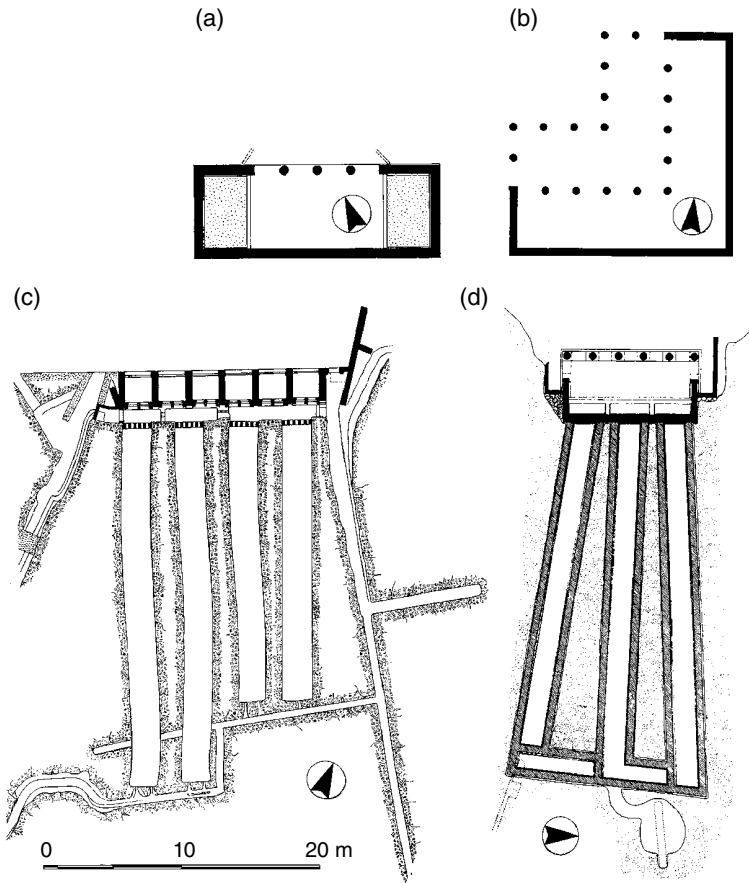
Plans of Fountains at uniform scale: (a) Southeast Fountain House (Athens); (b) Southwest Fountain House (Athens); (c) Peirene Fountain (Corinth); (d) fountain house (Perachora). *Source:* (a–b) adapted from Travlos, used with permission of American School of Classical Studies at Athens; © B. Robinson; (d) adapted from Tomlinson 1979, used with permission of the British School at Athens.
